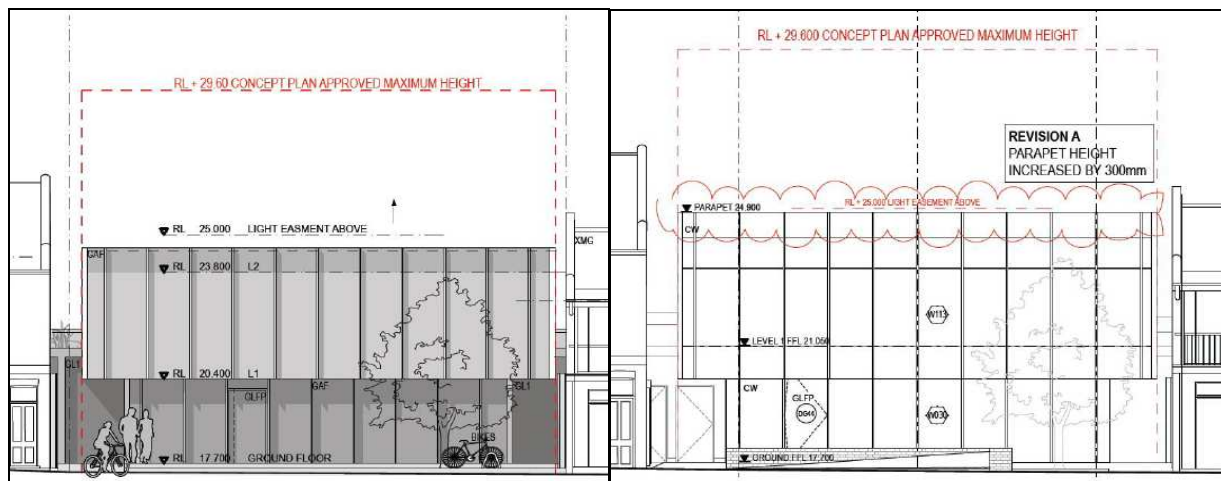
Approved (left) and proposed (right) modifications to parapet height at No. 40-42 Kensington Street (Source: Proponent's Application)
